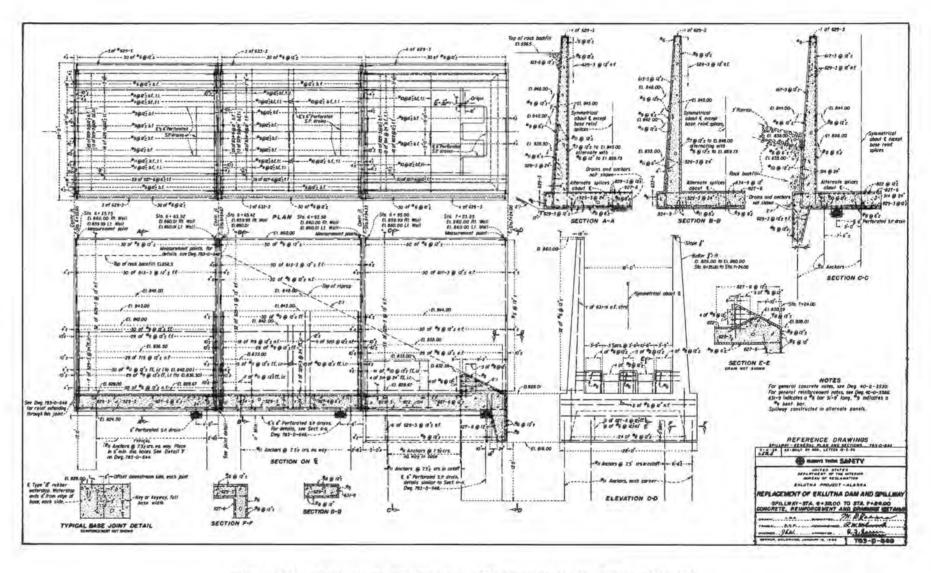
Spillway design details -- Station 6+35. 00 to station 7+24. 00.
